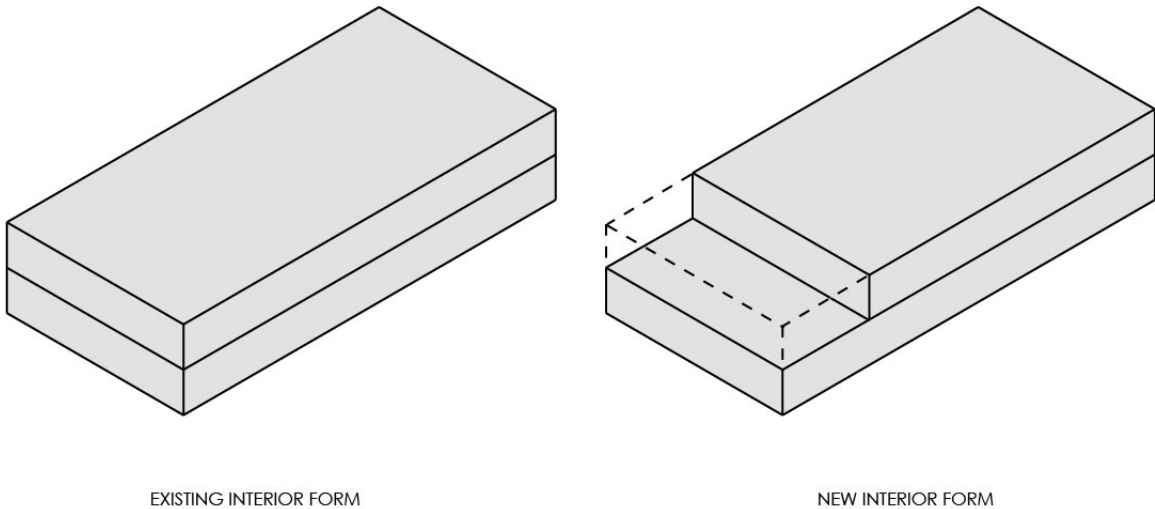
Proposal to cut the second story flooring to provide access to the first floor allows for both floors to be connected.
